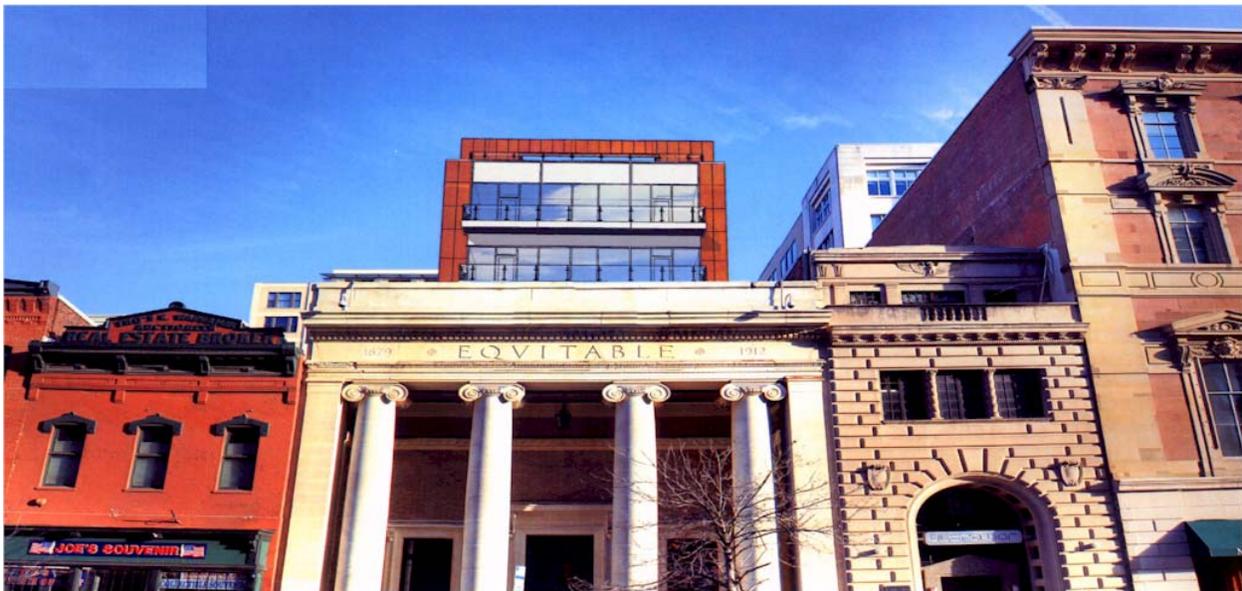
Proposed view from F Street NW showing existing taller buildings on either side of the proposed addition.
